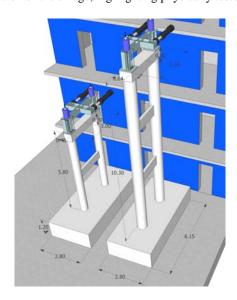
Geometry of the bridge piers and test set up (Source: F. Paolacci)
